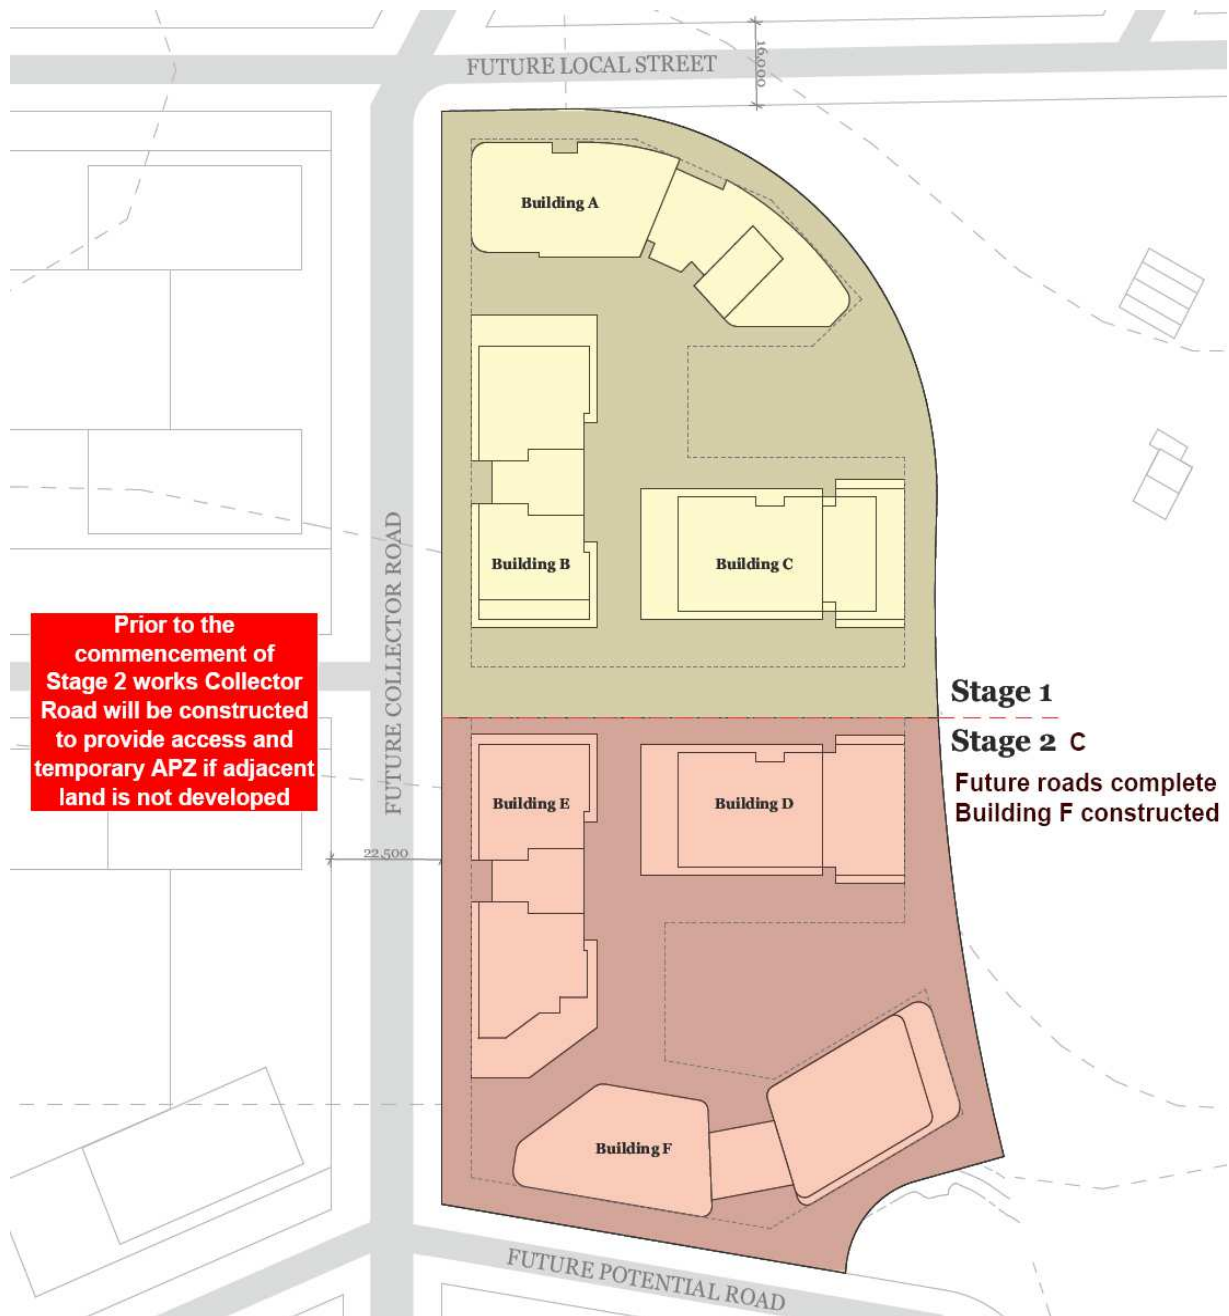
Plan of Asset Protection Zone – Stage 2.
